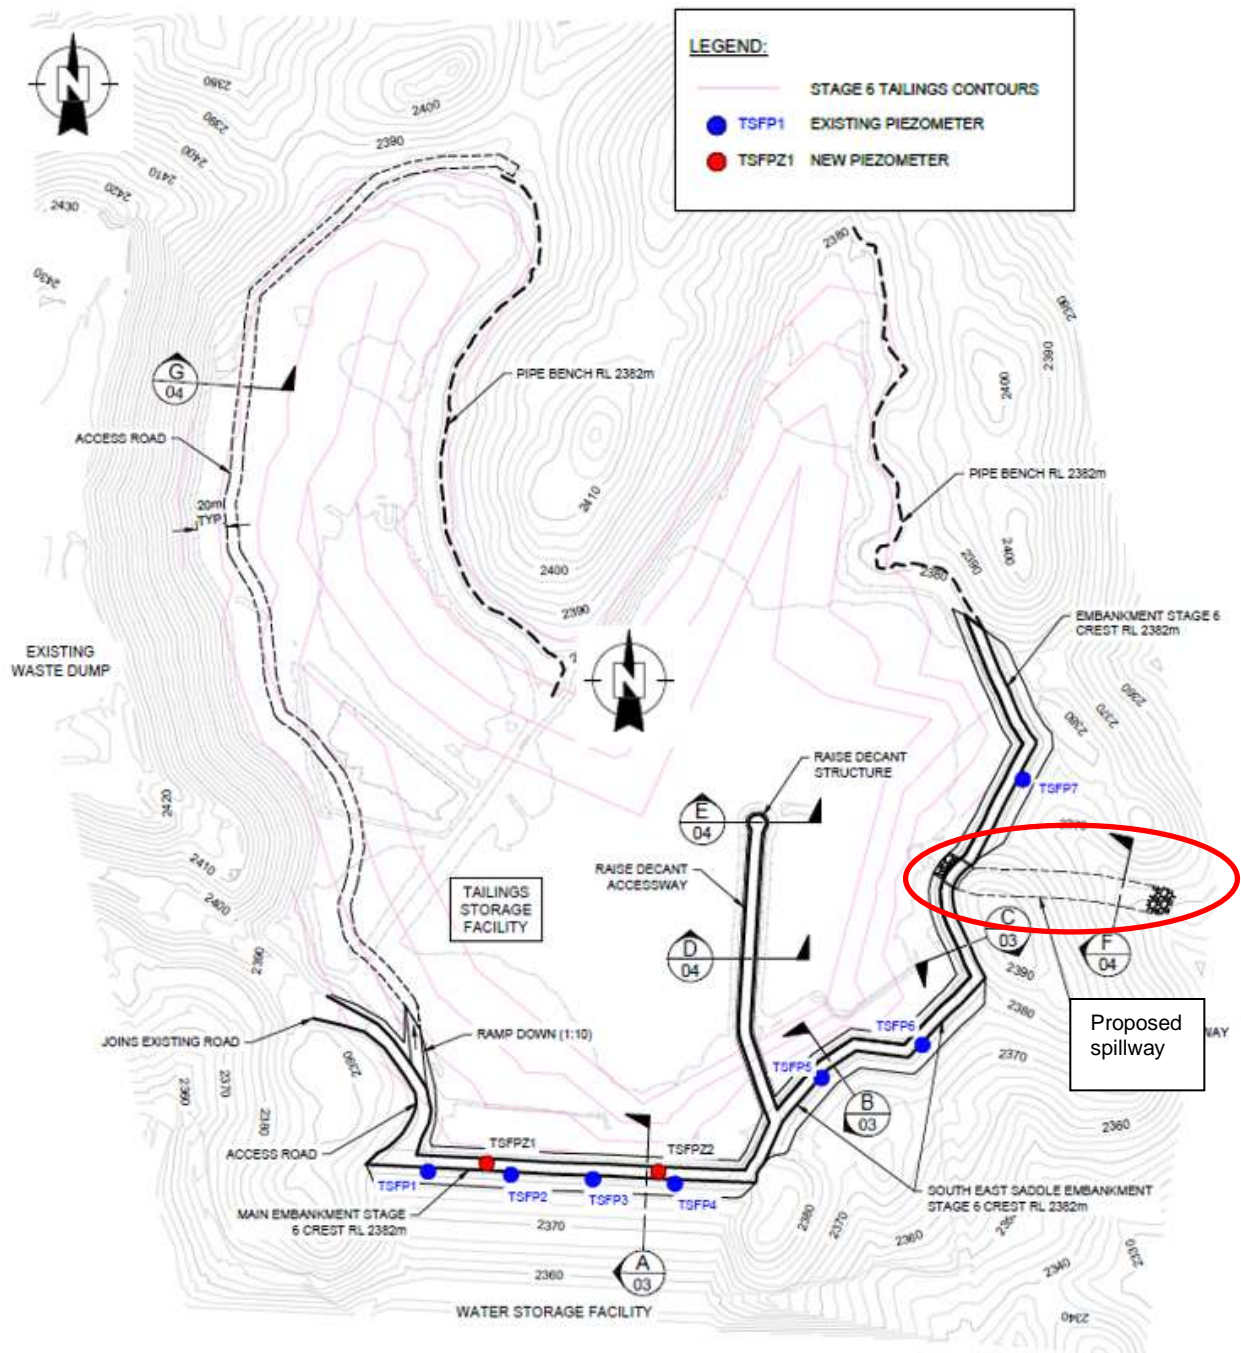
TSF1 including location of spillway and new piezometers. Bold sections are proposed for lift from 378 to 382mRL (amendment 2021).
